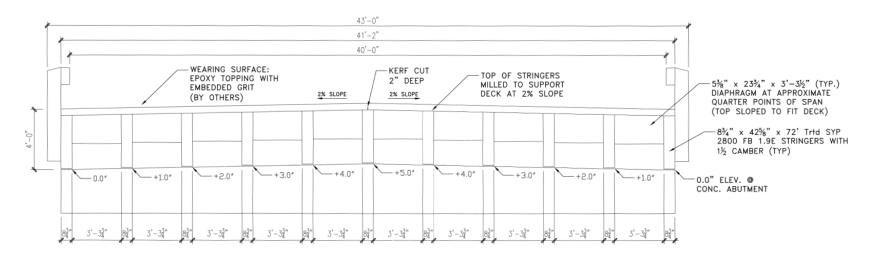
Cross-section view of composite timber bridge, page 2/3 in Appendix A
